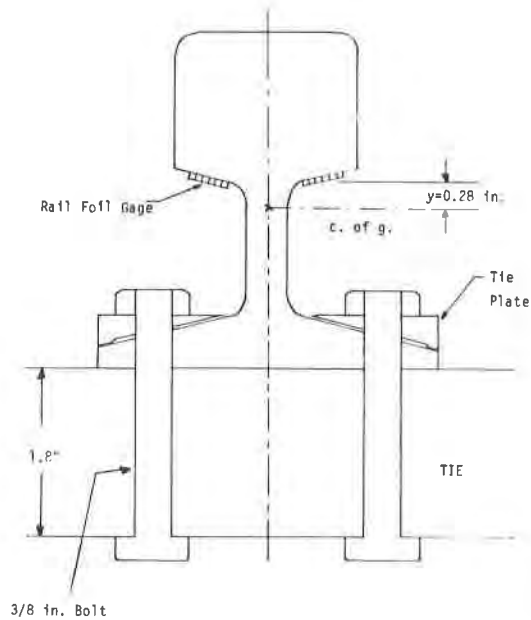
Light Crane Rail with Tie Plate and Rail Gages. (1 in.=2.54cm, 1 lb=4.45N)
